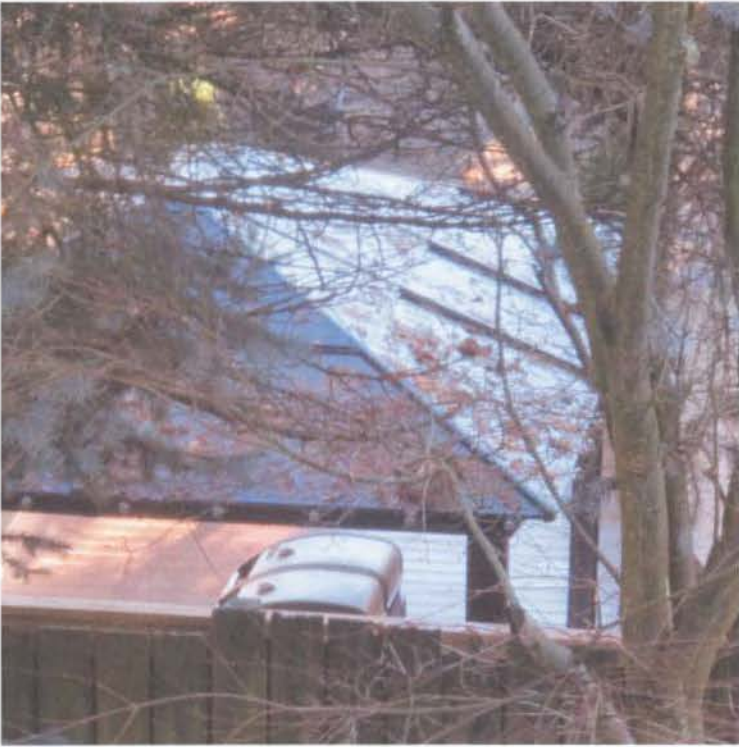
Exhibit J: City of Kirkland: Fence, Deck, and Retaining Wall Replacement – Modification for 9 ft. combined Fence, deck and Retaining Wall.
